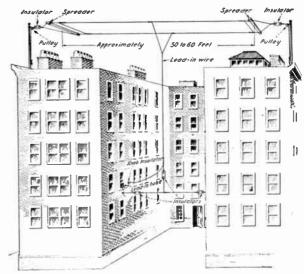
Illustrating a method of installing an antenna on the roof of an apartment house.
